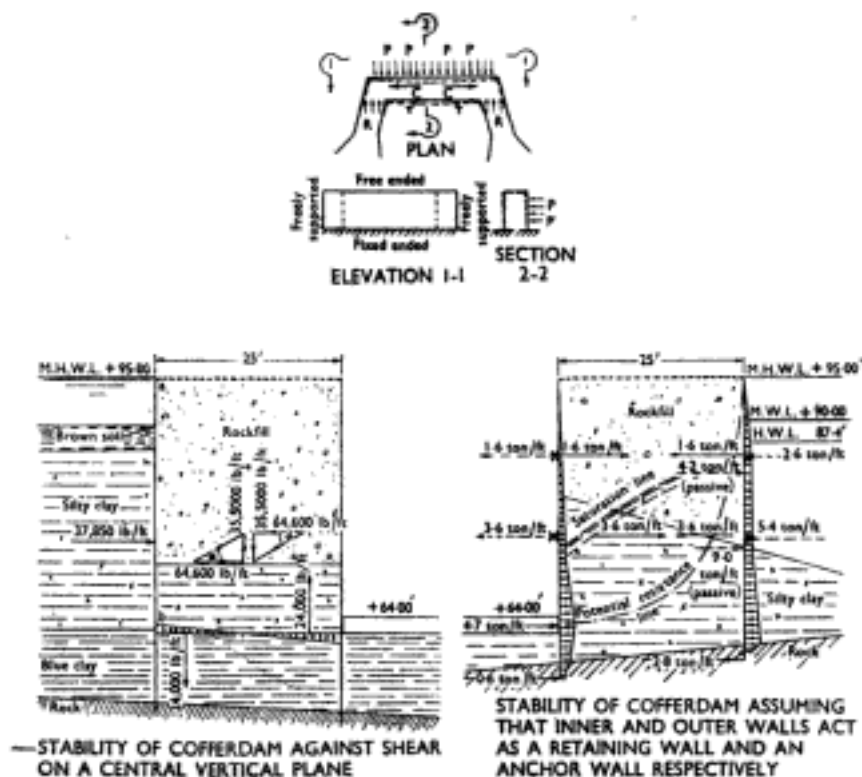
Chola cofferdam, India: (a) plan and assumed support conditions; (b) basis of design, stability considered by shear induced on a vertical plane and assuming inner and outer walls act as a retaining wall and anchor wall (Ellis¹⁴)
